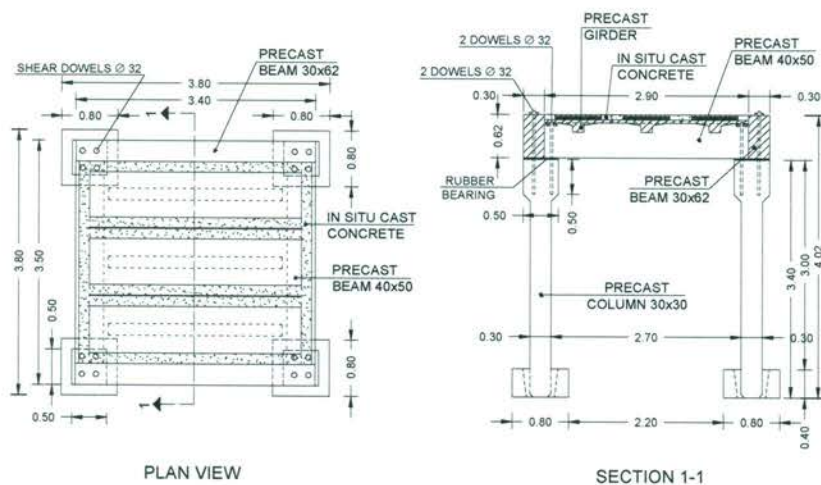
Top view and vertical cross section of the specimen used in the 5th series of experiments.
